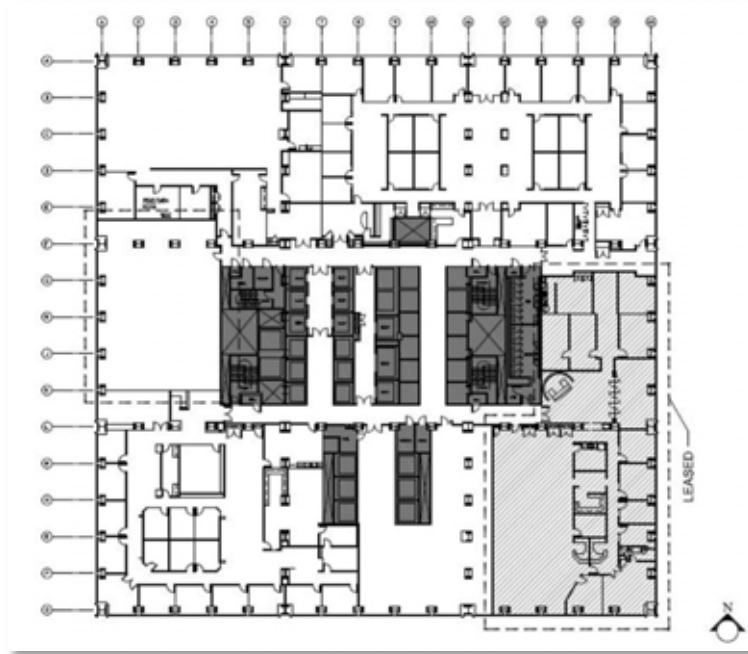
FLOOR PLAN, WILLIS TOWER
